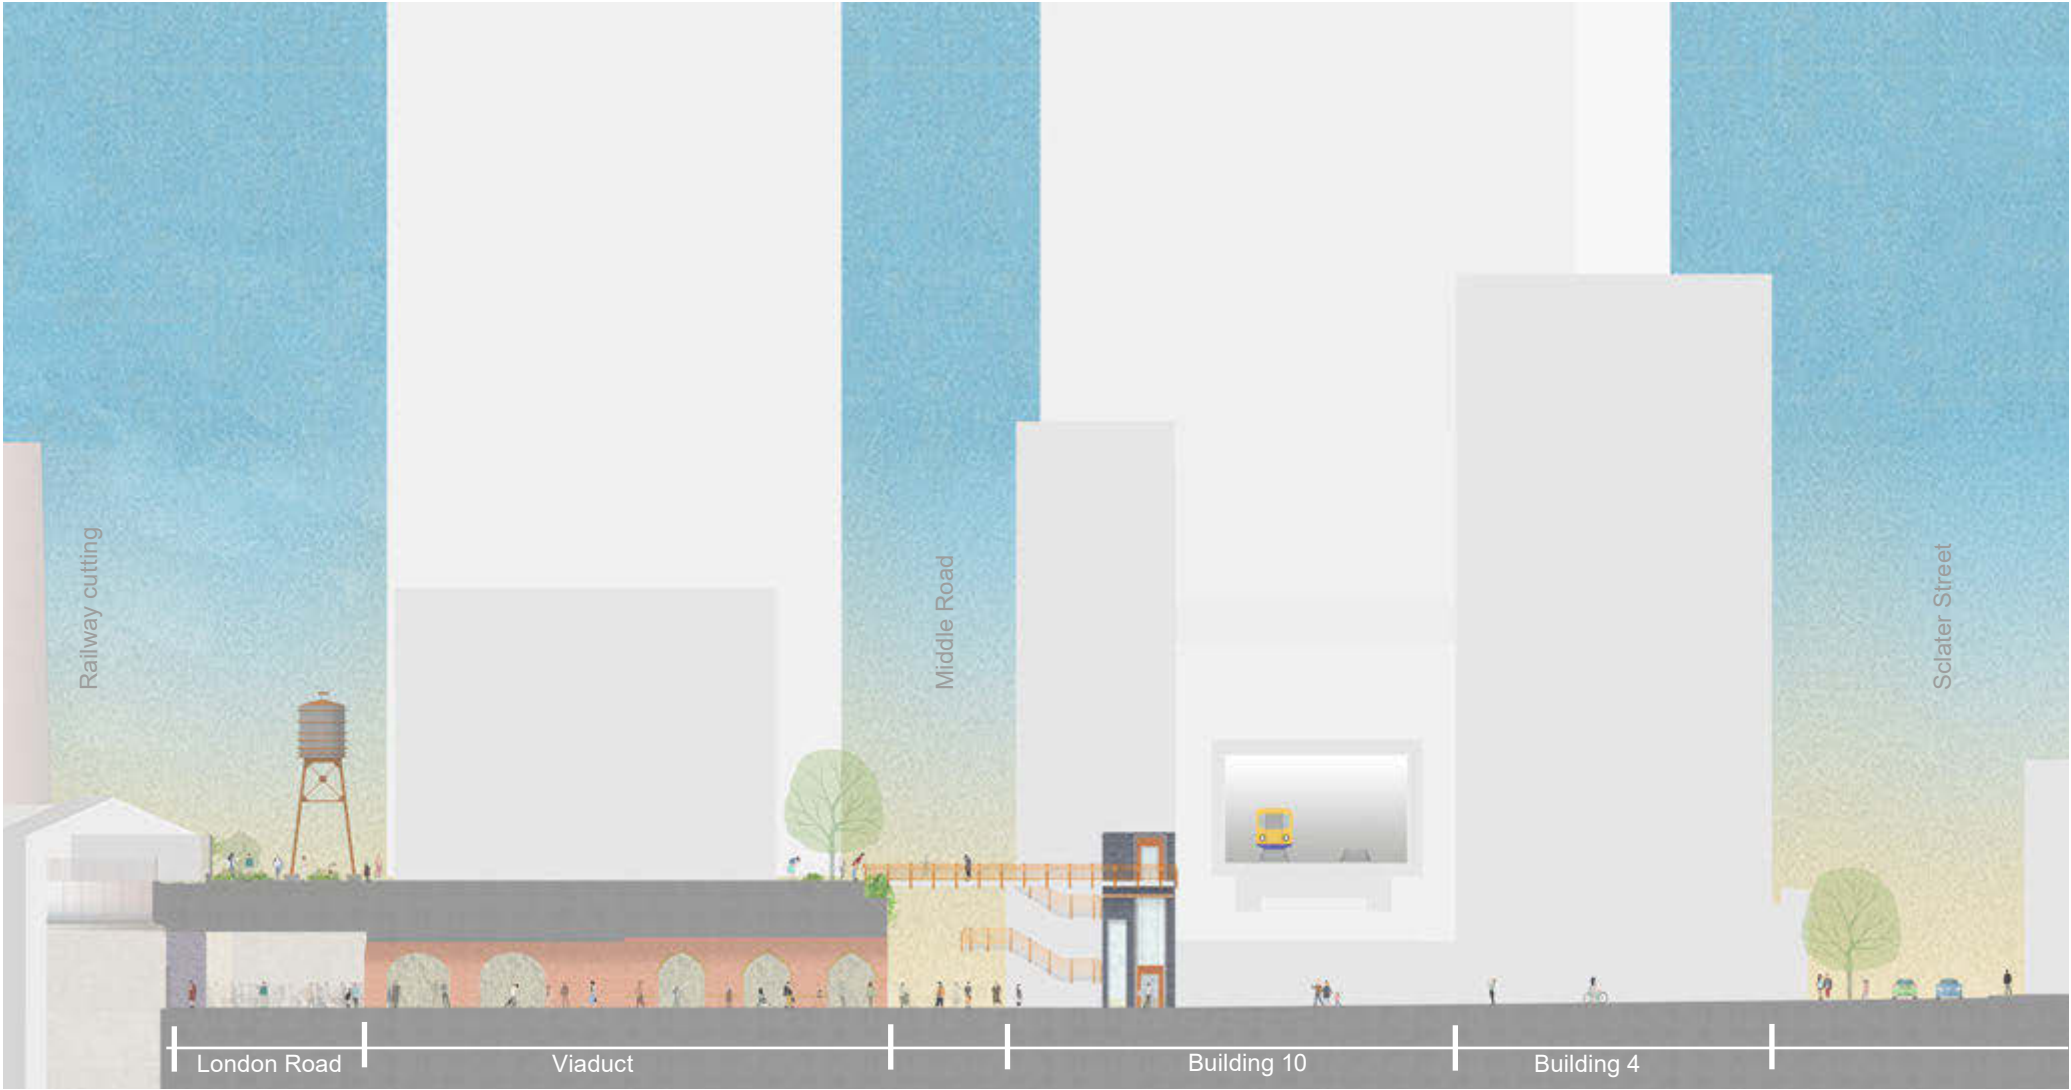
Sectional elevation: Farthing Lane looking west
